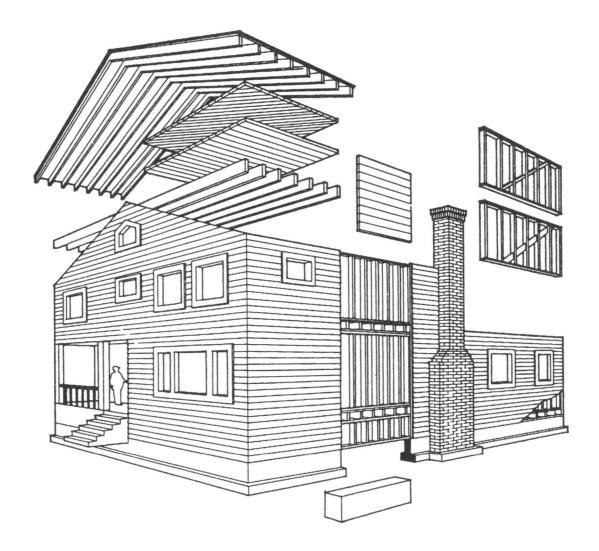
Typical pre-1940 wood frame building. *Lagorio and others, 1986*.
